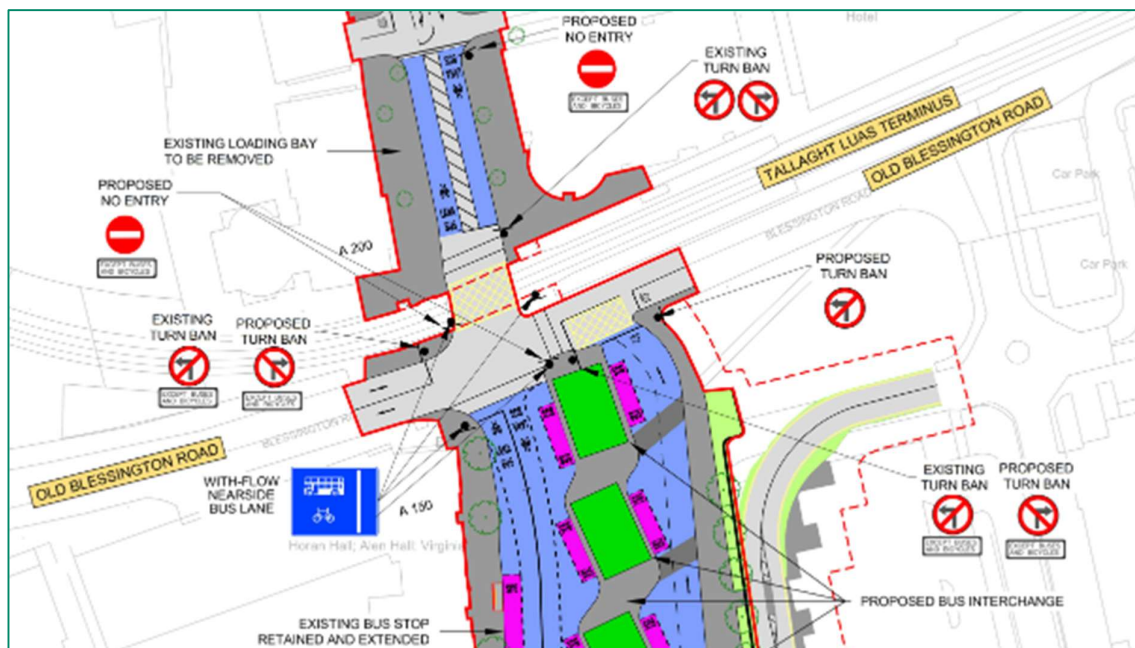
Extract of General Arrangement Drawings at Luas Red line / Old Blessington Road
